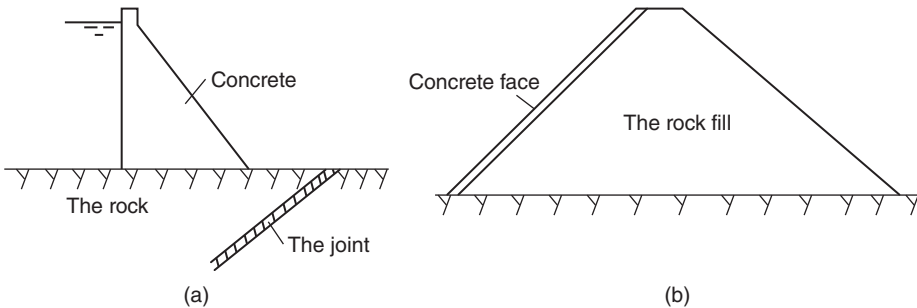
Partition composite model. (a) Concrete gravity dam. (b) Concrete-faced rock-fill dam.
